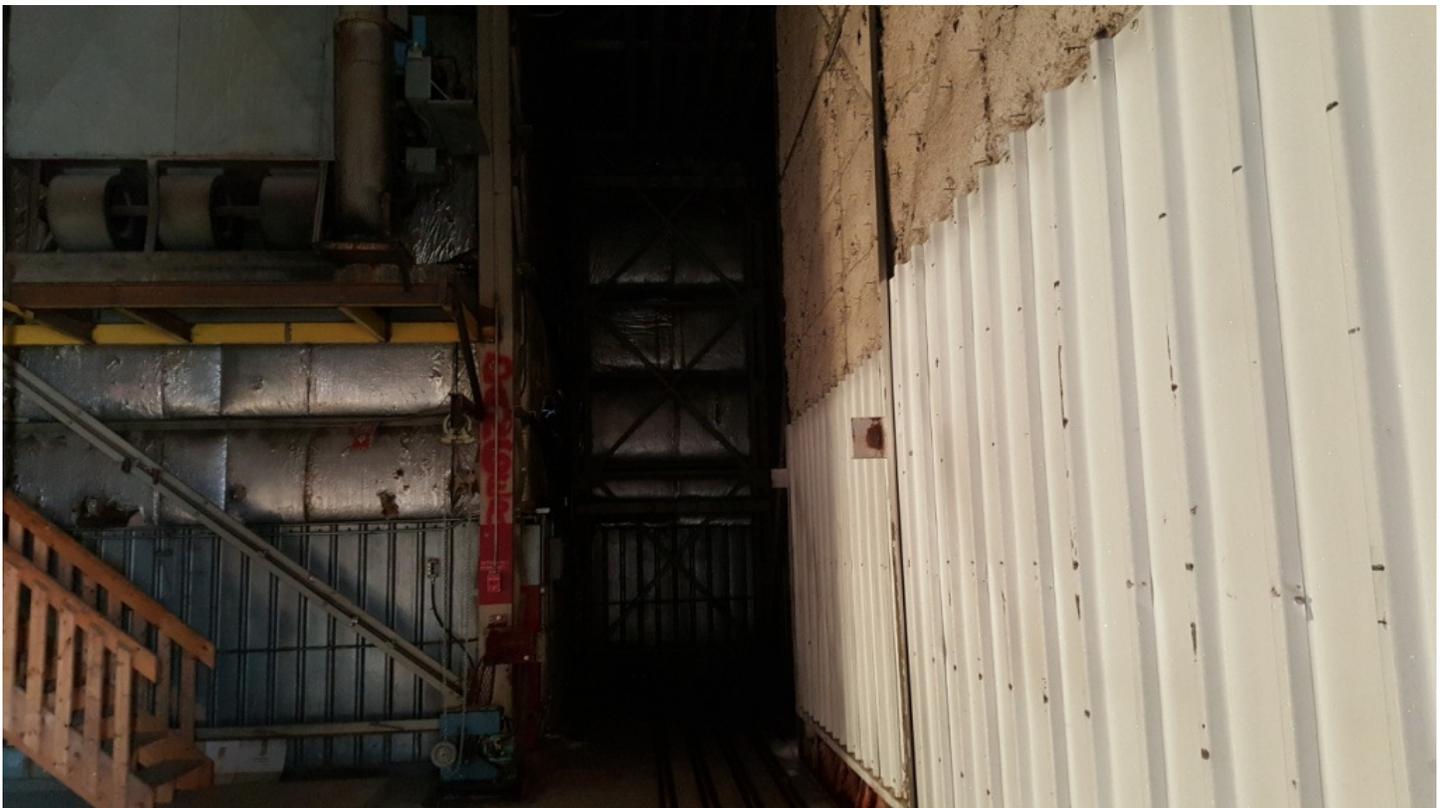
Interior Elevation Showing Column Spacing and Height at Hangar Door Storage Area.
